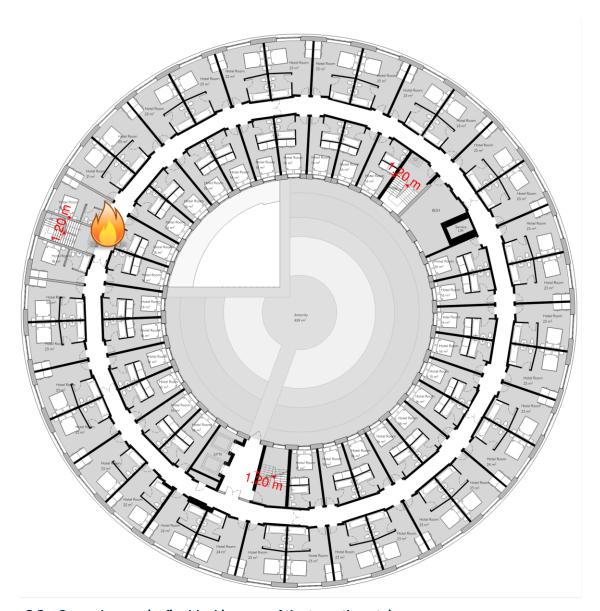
Second scenario, fire blocking one of the two other stairs
